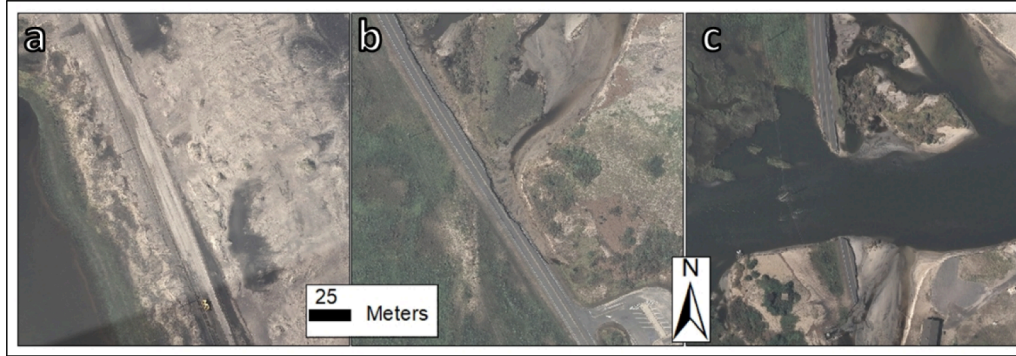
Storm impacts to the highway after Hurricane Irene in August 2011: (a) overwash sand covered road; (b) ocean-side erosion damaged pavement; (c) island breach damaged pavement.
